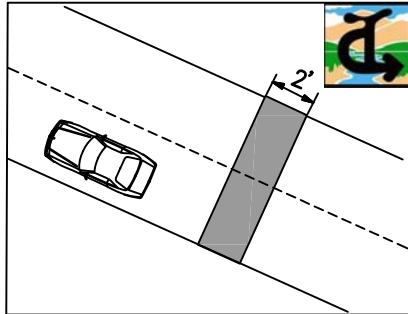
Example 8: Surface tolerances for street repairs should meet the standard for new construction.
